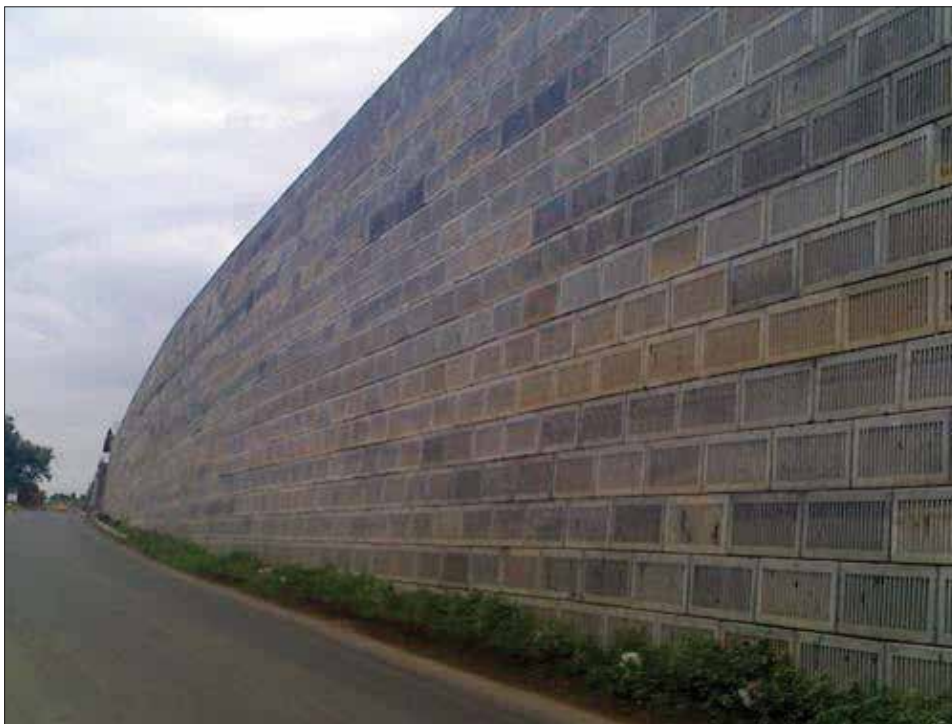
Elevation view of Nagpur-Hyderabad Section
